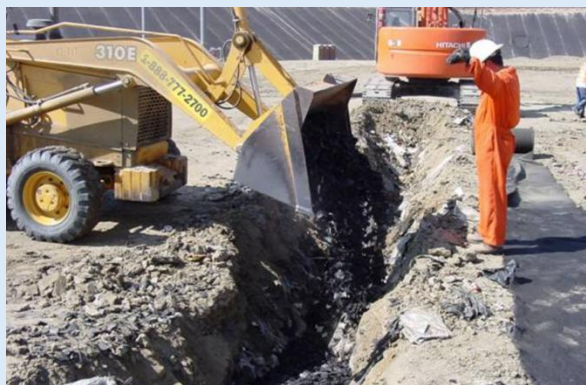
TDA was placed at the bottom of the trench as a foundation for the pipe.
